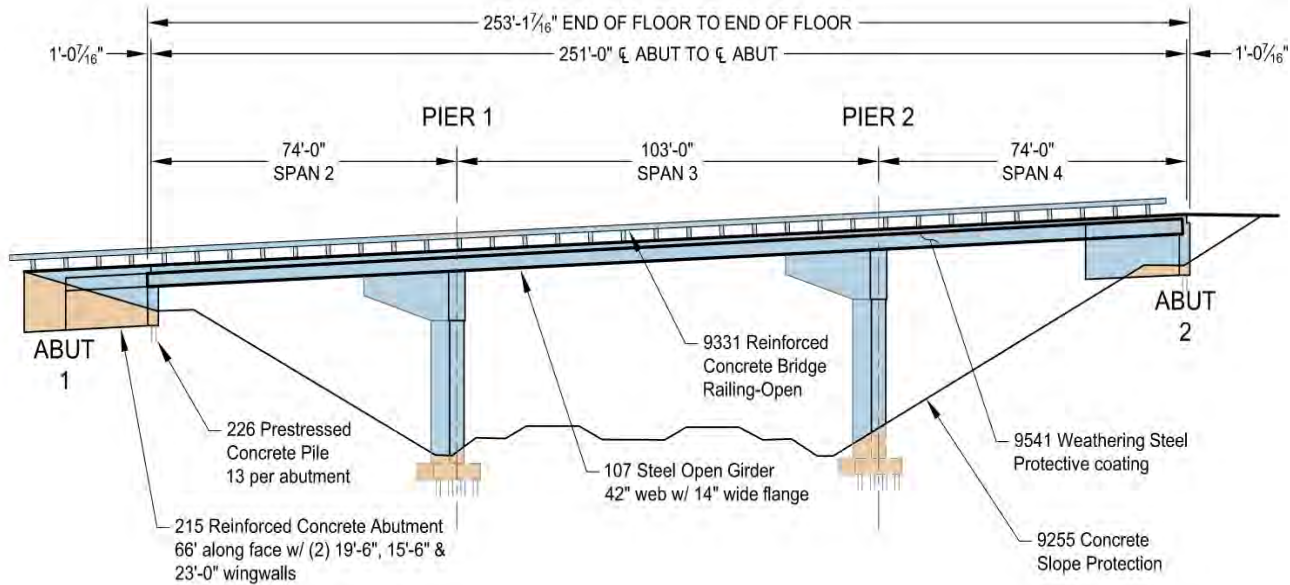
EI.24.9- 1: Elevation view of continuous steel girder bridge
